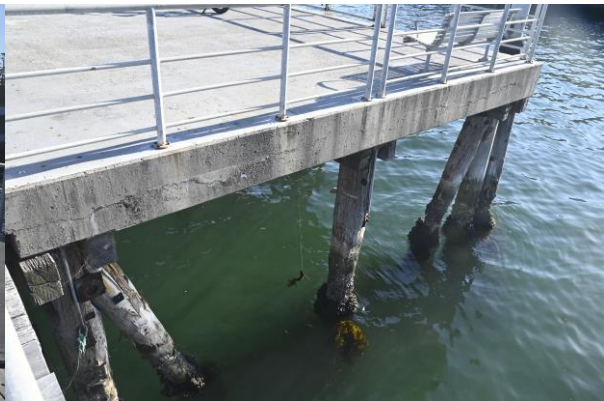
Detail view of Wharf 3 concrete deck and timber piers. The concrete deck is the site of the former Ferris Wheel. (Artefact, 2021)
